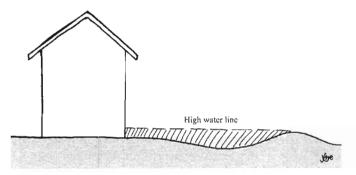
A. A poorly planned and located berm 'n basin backing water up against the house
